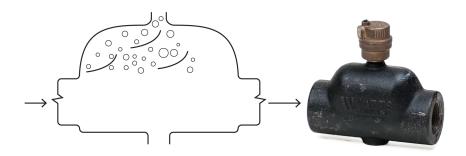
Air scoop and cutaway showing baffles for directing air. (Skilled Trades BC, 2021) Used with permission.
